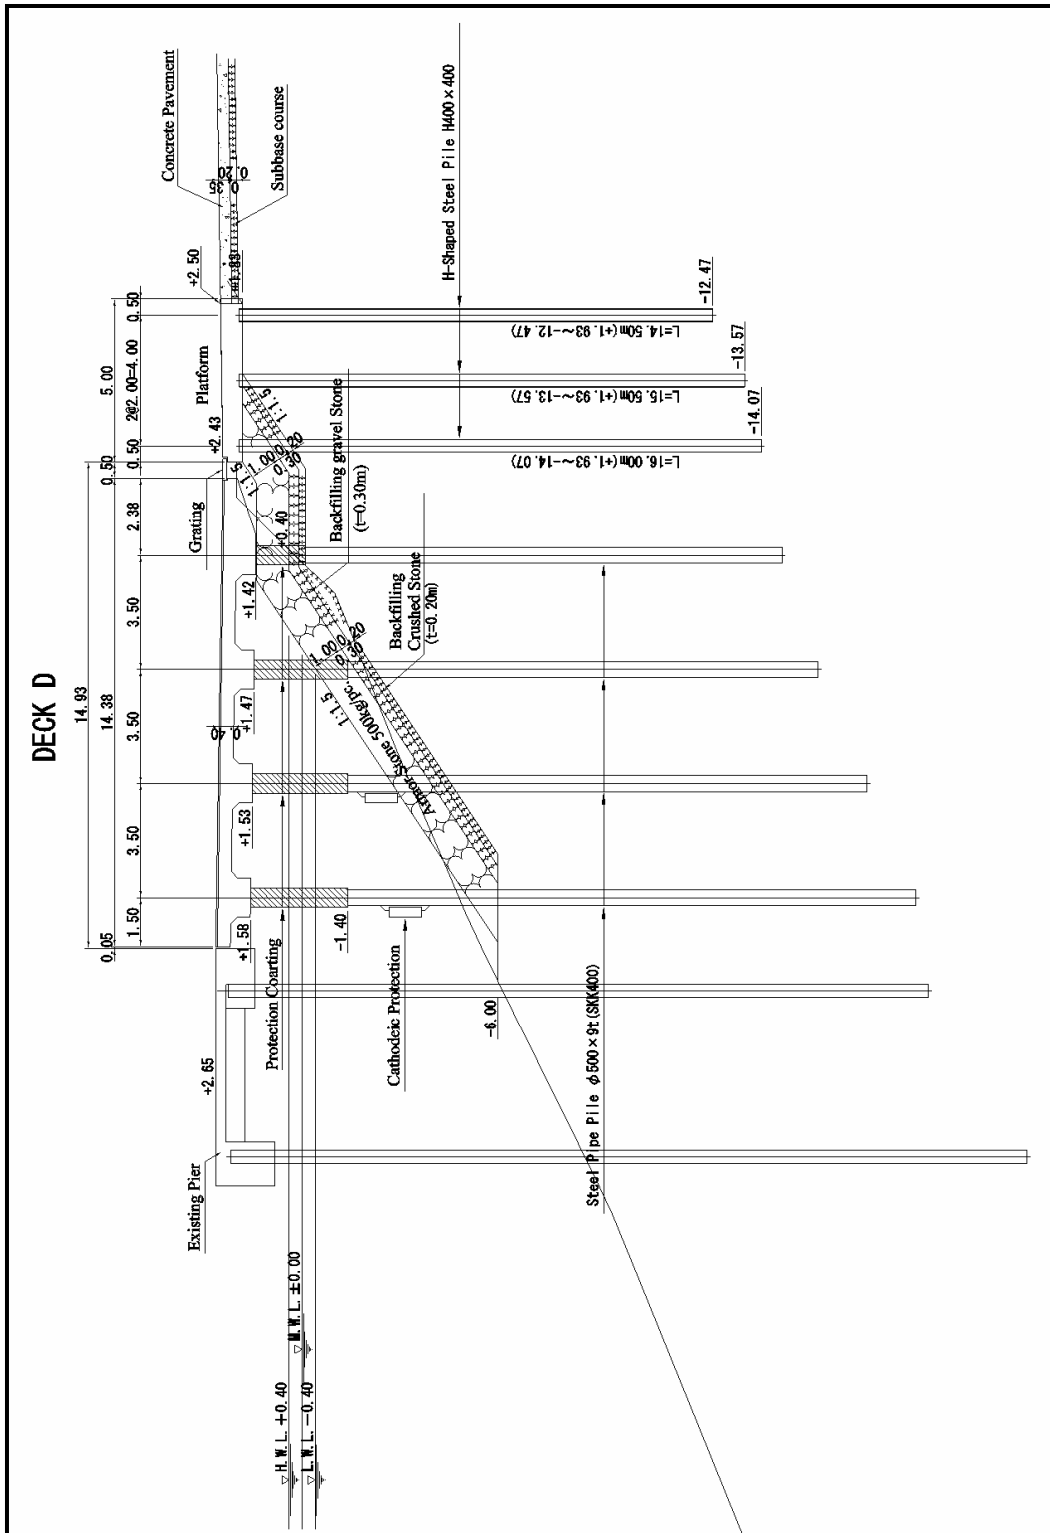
Section plan of the concrete deck (in the westernmost part)
